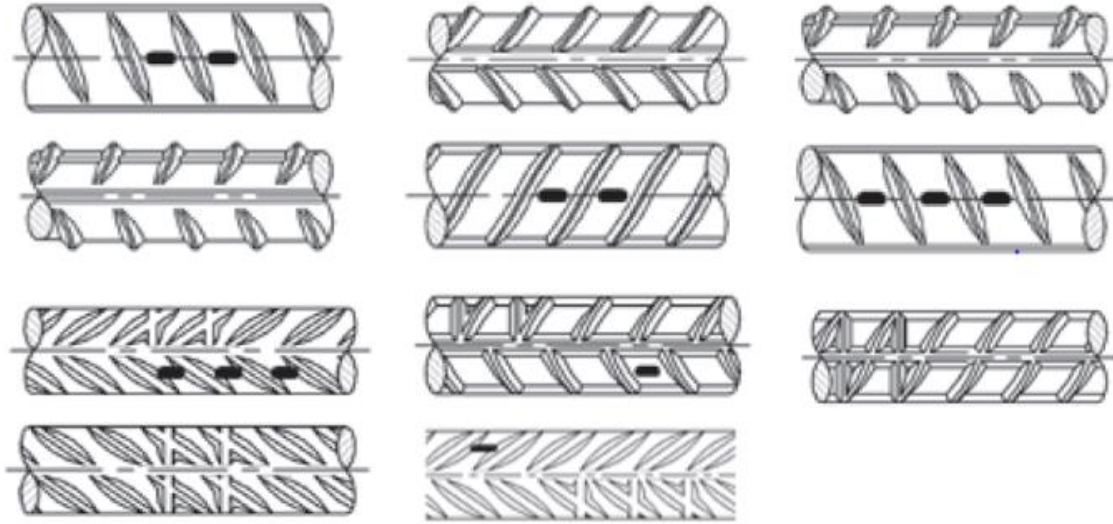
Rebar rib types (One Steel – essential technical data on the steel reinforcement)
